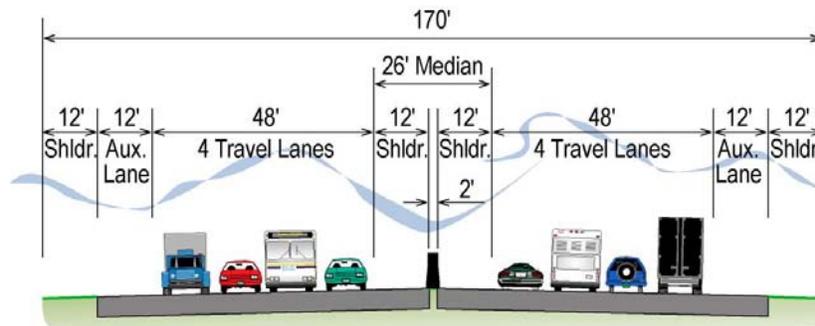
Package A Typical I-25 Cross Section -SH 7 to E-470
